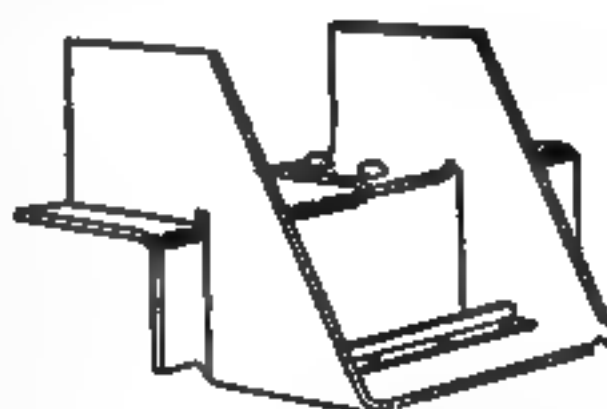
Duplex Steel Wall-hanger for Large Beams
